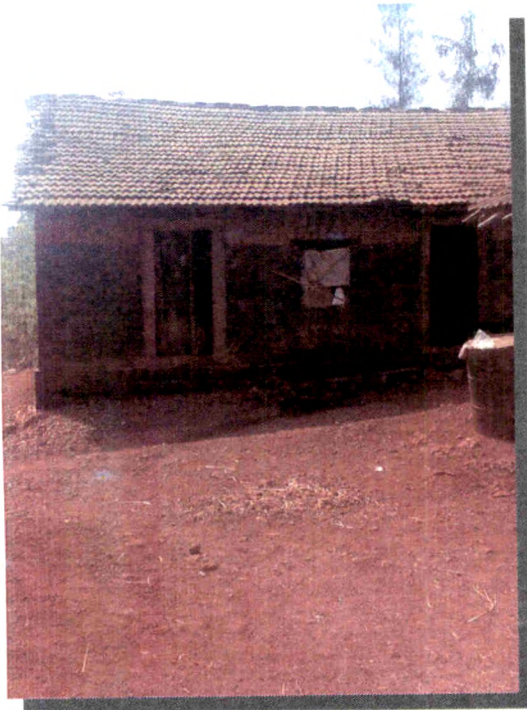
& 18 A Typical Thatched Walls and Tiles on Roof
